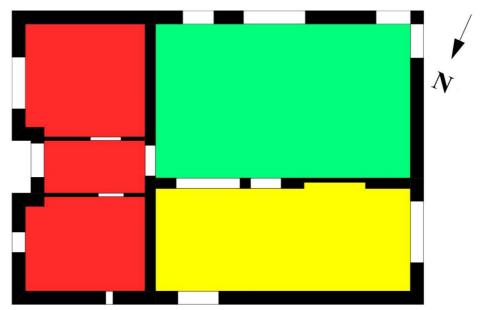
Ground floor plans of the brick building and the virtual straw-bale building coloured by zones
